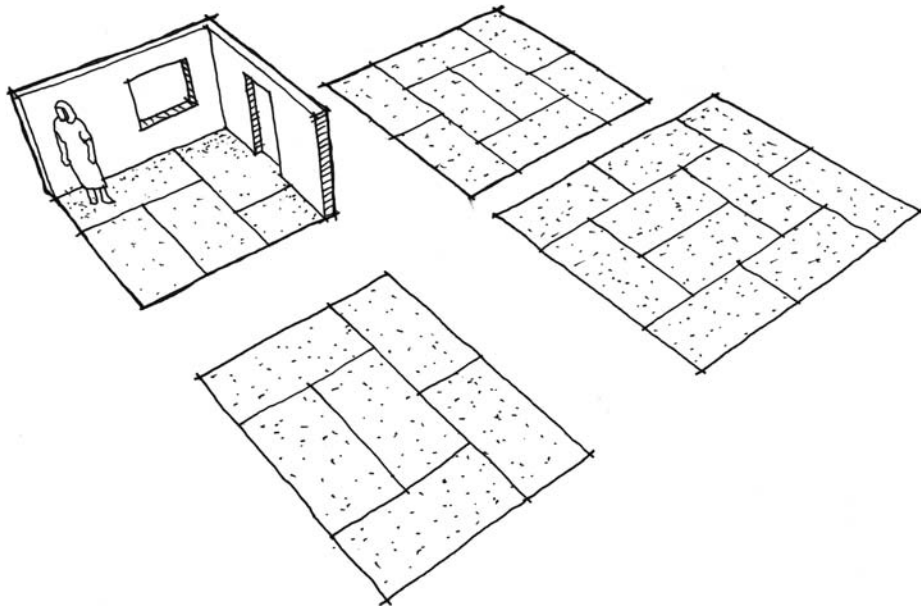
Room arrangements based on the modular tatami floor mat system. Mat layouts avoid intersecting lines and can range from a small $4\frac{1}{2}$ -mat system to a system with 6, 8, 10, or even larger numbers of mats.
